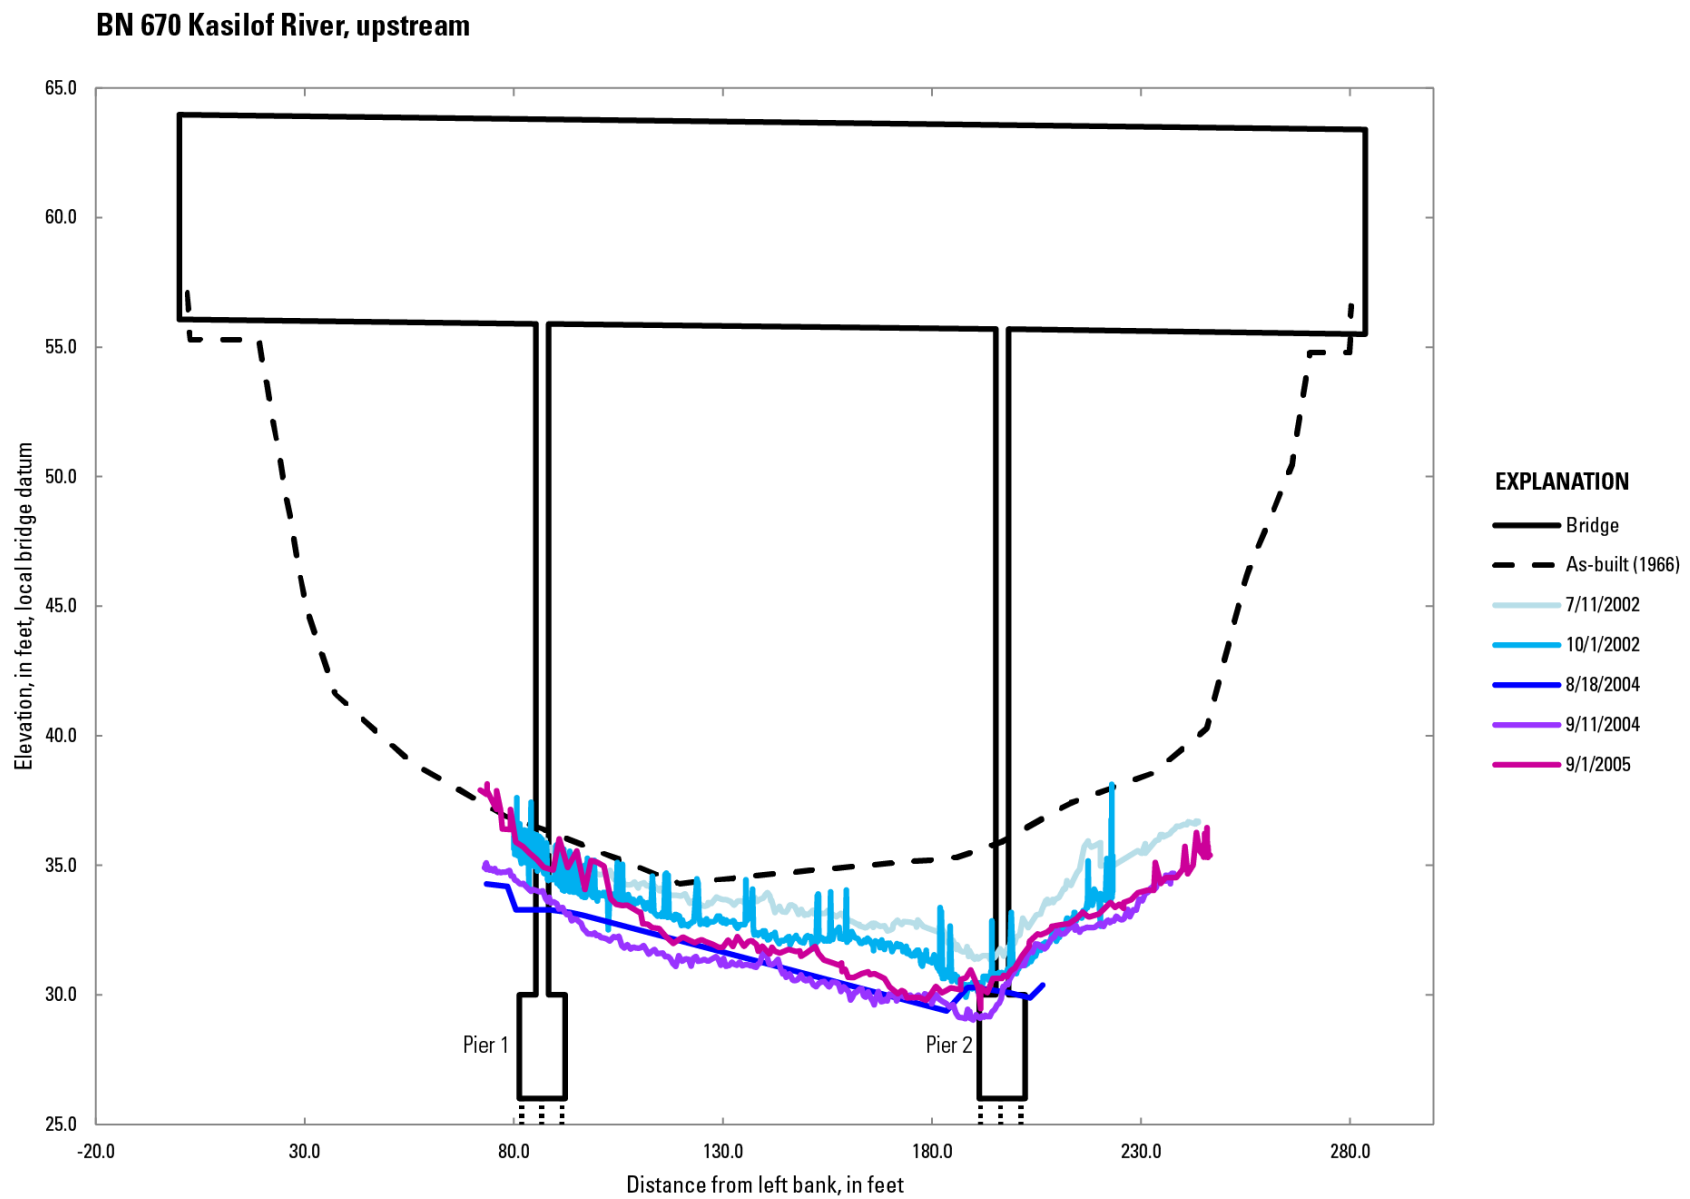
Cross sections showing upstream soundings at bridge 670, Kasilof River, Alaska, 2002–05.
